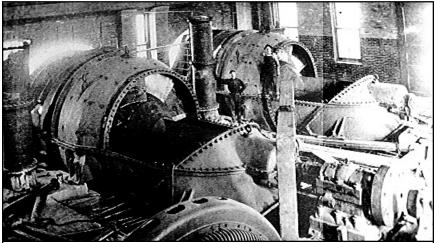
Interior view of Drainage Pumping Station No. 1, showing two 12' Wood screw pumps during installation, ca. 1914-1915 (from Sewerage & Water Board 1914).
